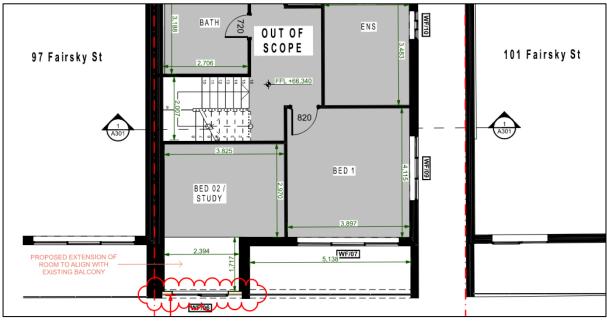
Amended Floor Plan to show extension alignment with first-floor balcony. Source: Applicant's submitted amended architectural plans, 15/10/2024.
